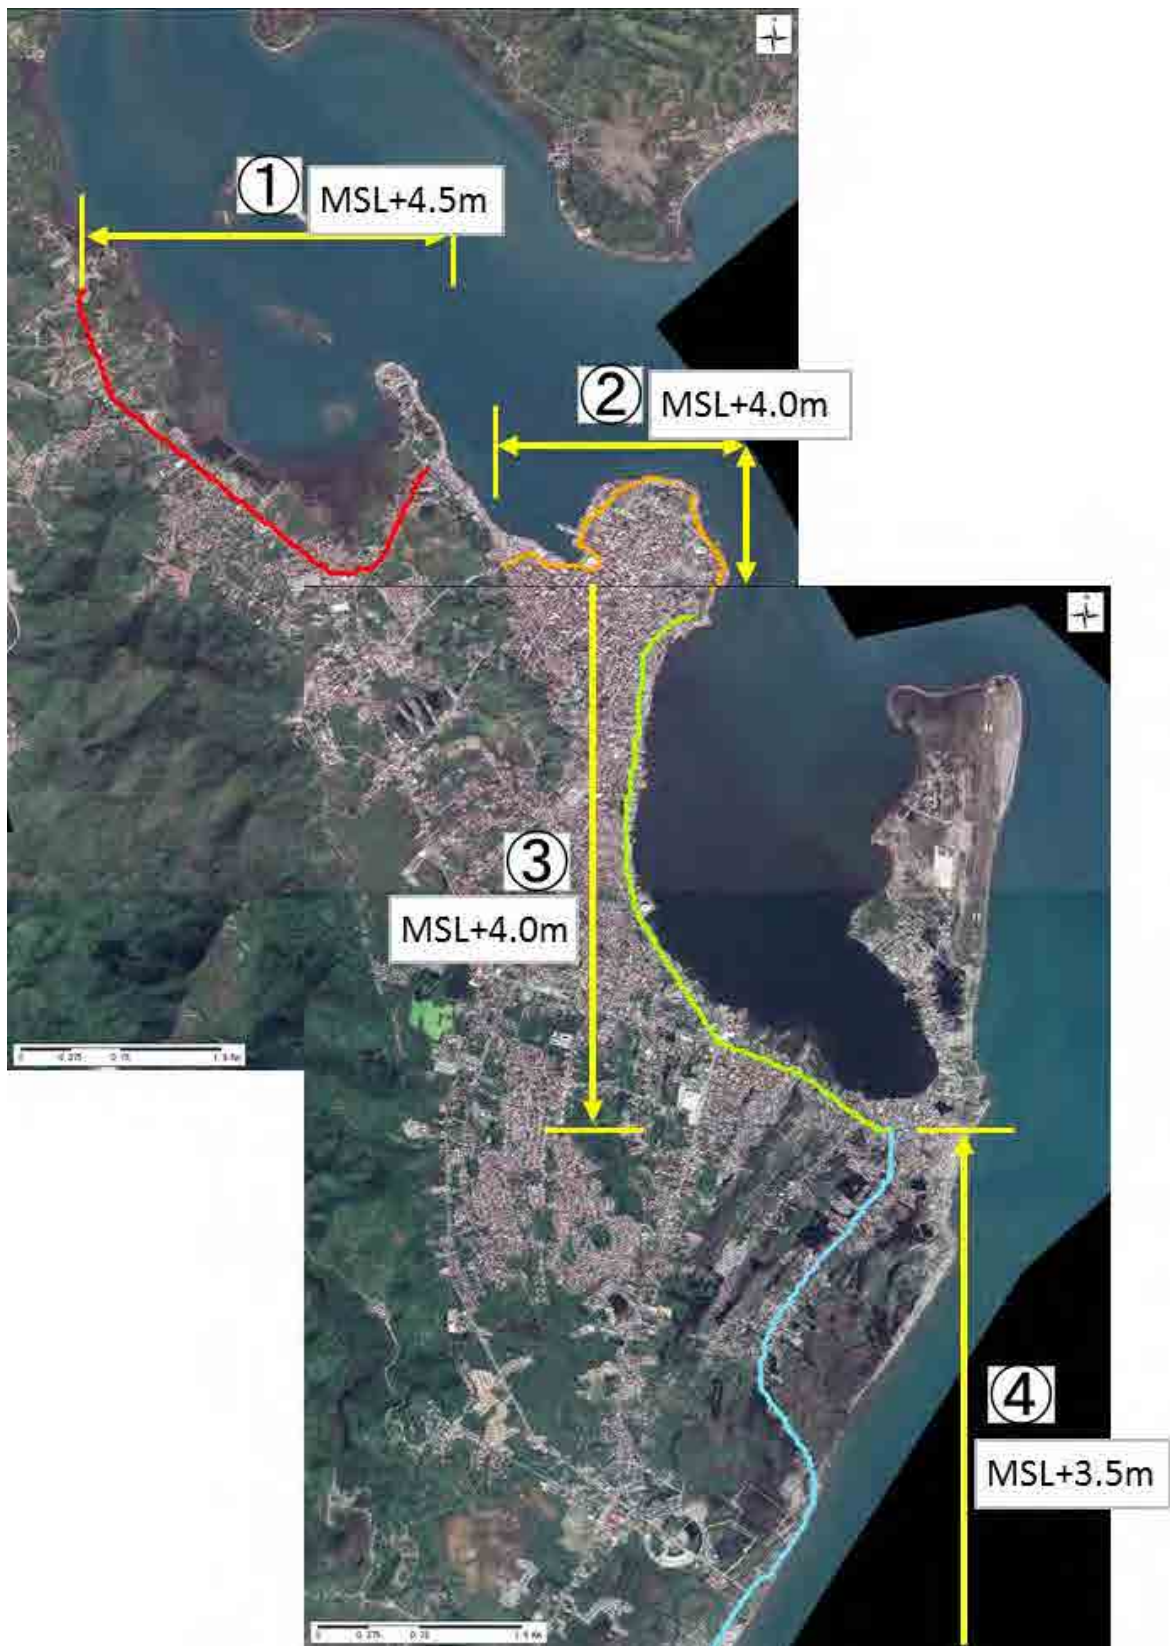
Top Elevation of Heightened Road and Tidal Embankment
